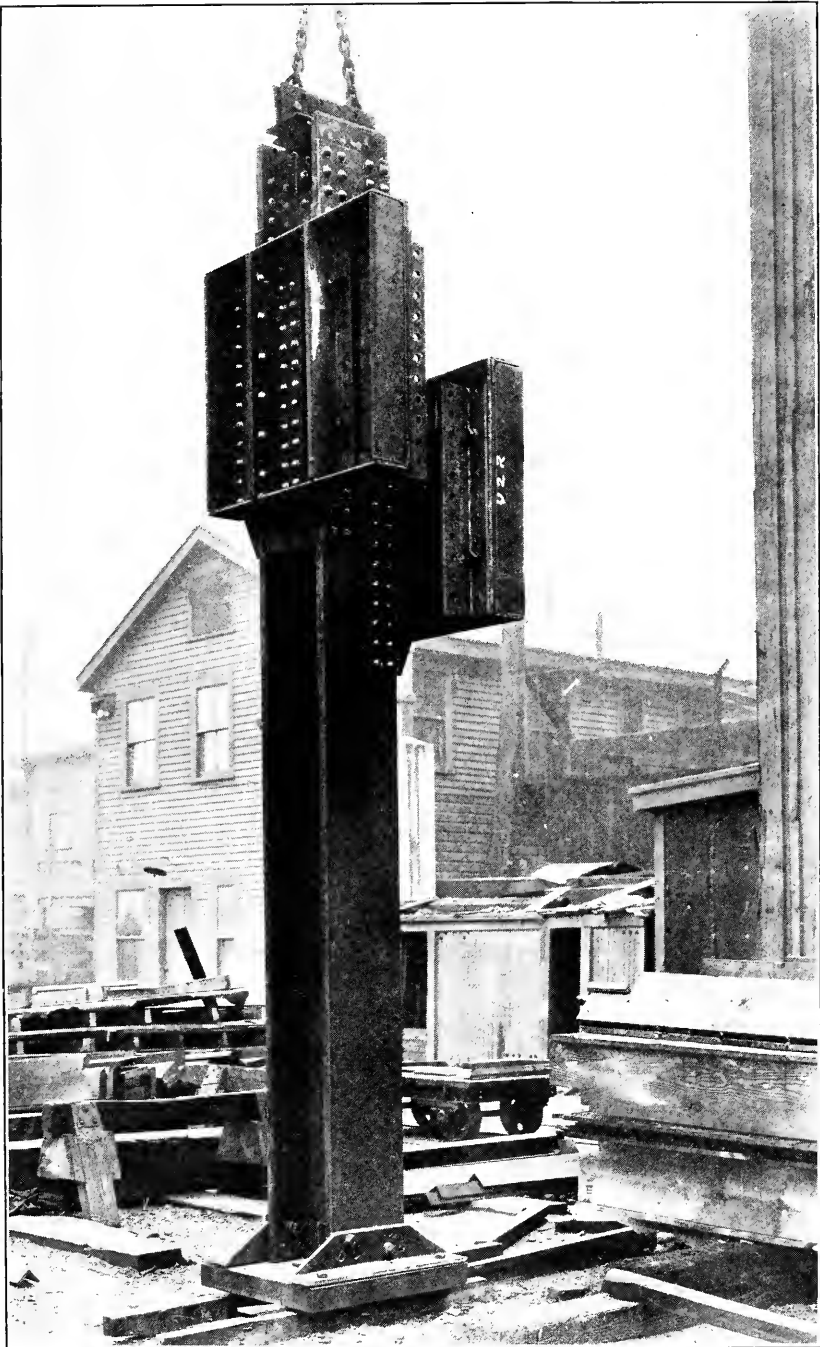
PLATE X.—TYPICAL COLUMN DESIGNED FOR HEAVY EC-
